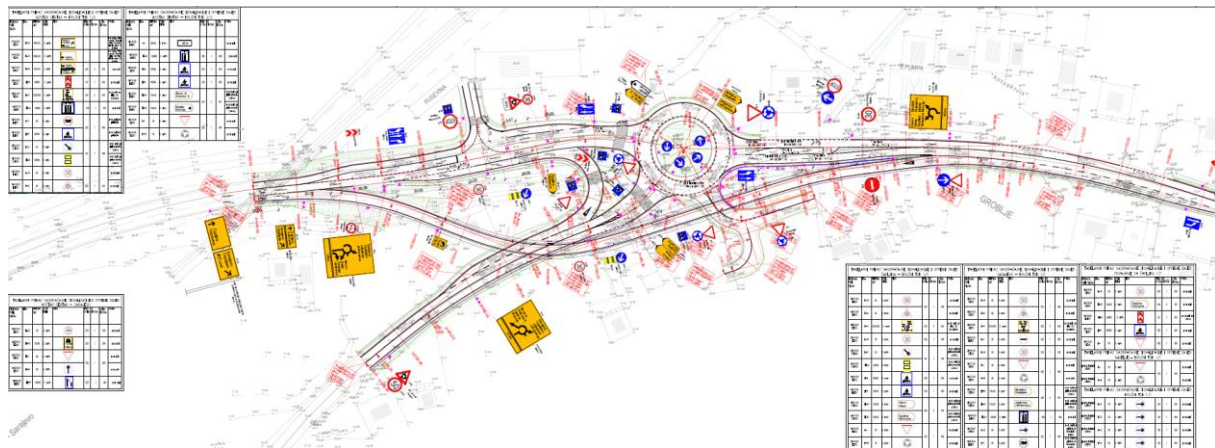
Traffic Layout – North Entrance to Mostar Intersection
